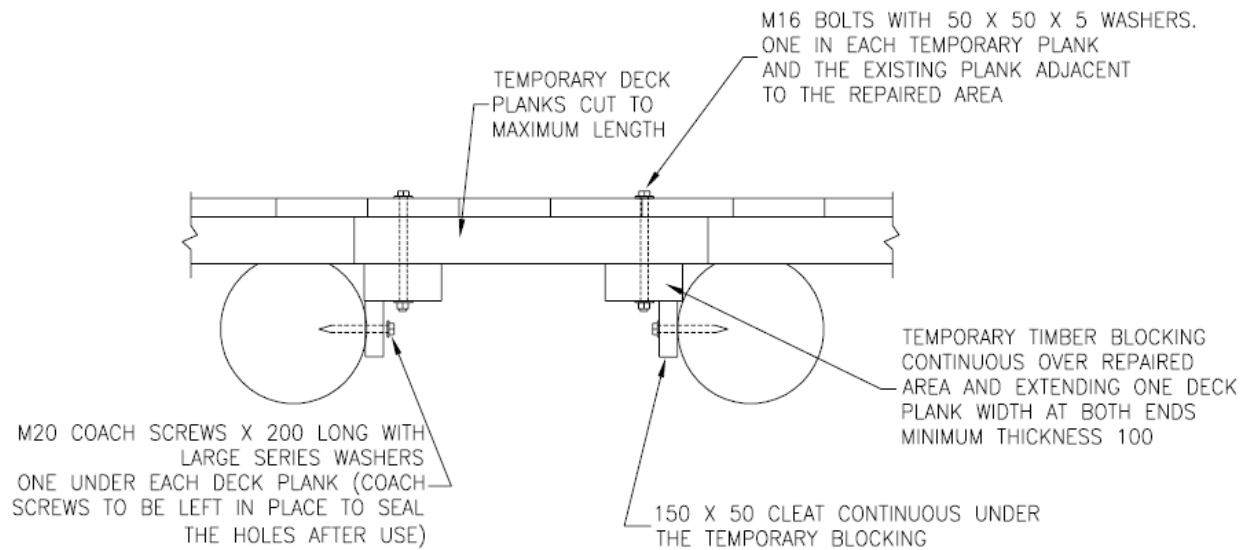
Local replacement of timber decking and added sheeting – cross-section view
